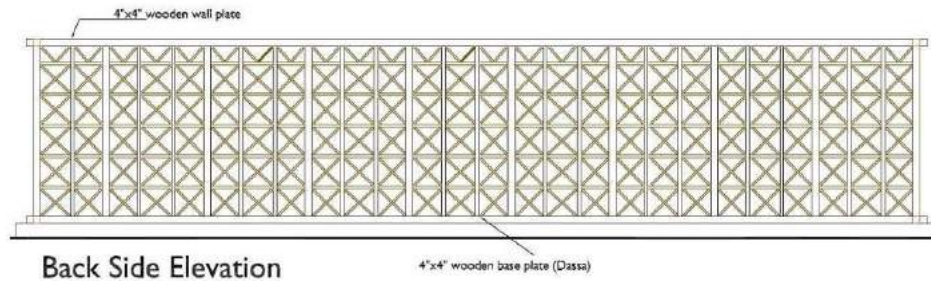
Typical rear elevation of an “engineered” dhajji dewari building after the 2005 Pakistan earthquake
